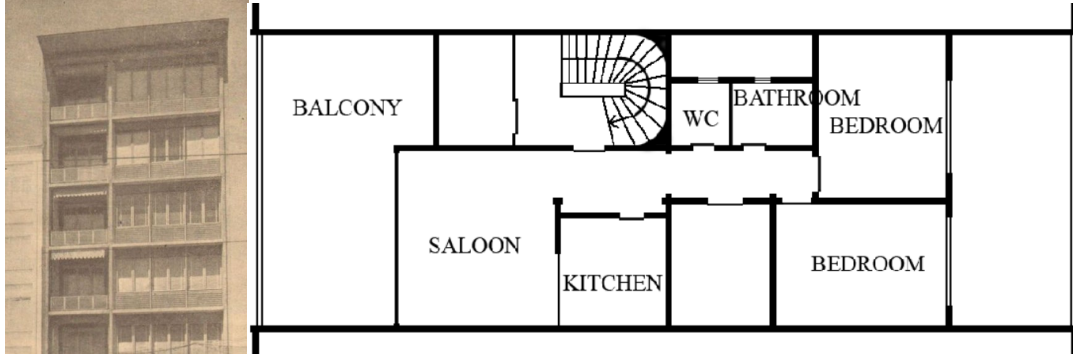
Photograph of M.K. Apartment and floor plan (Bayhan 1957, Redrawn by Akdaş)
